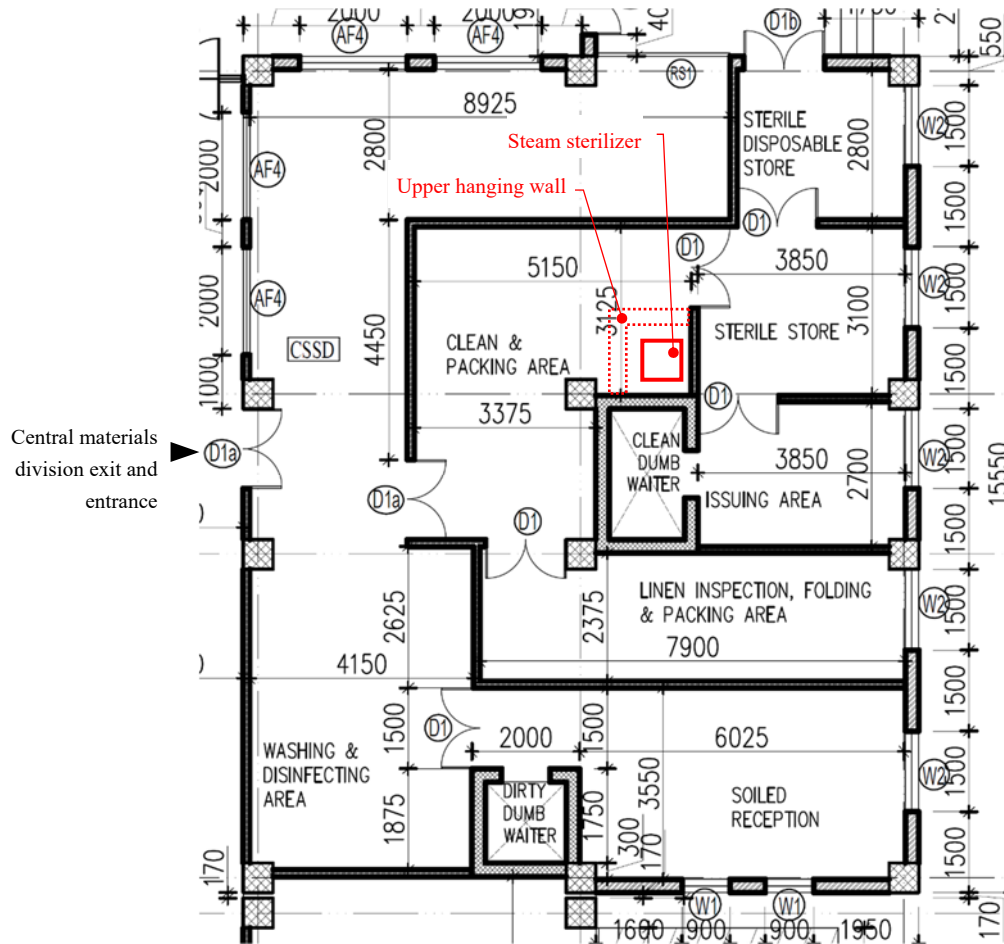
Basement B1 floor plan, BLOCK 3 (MCH)
